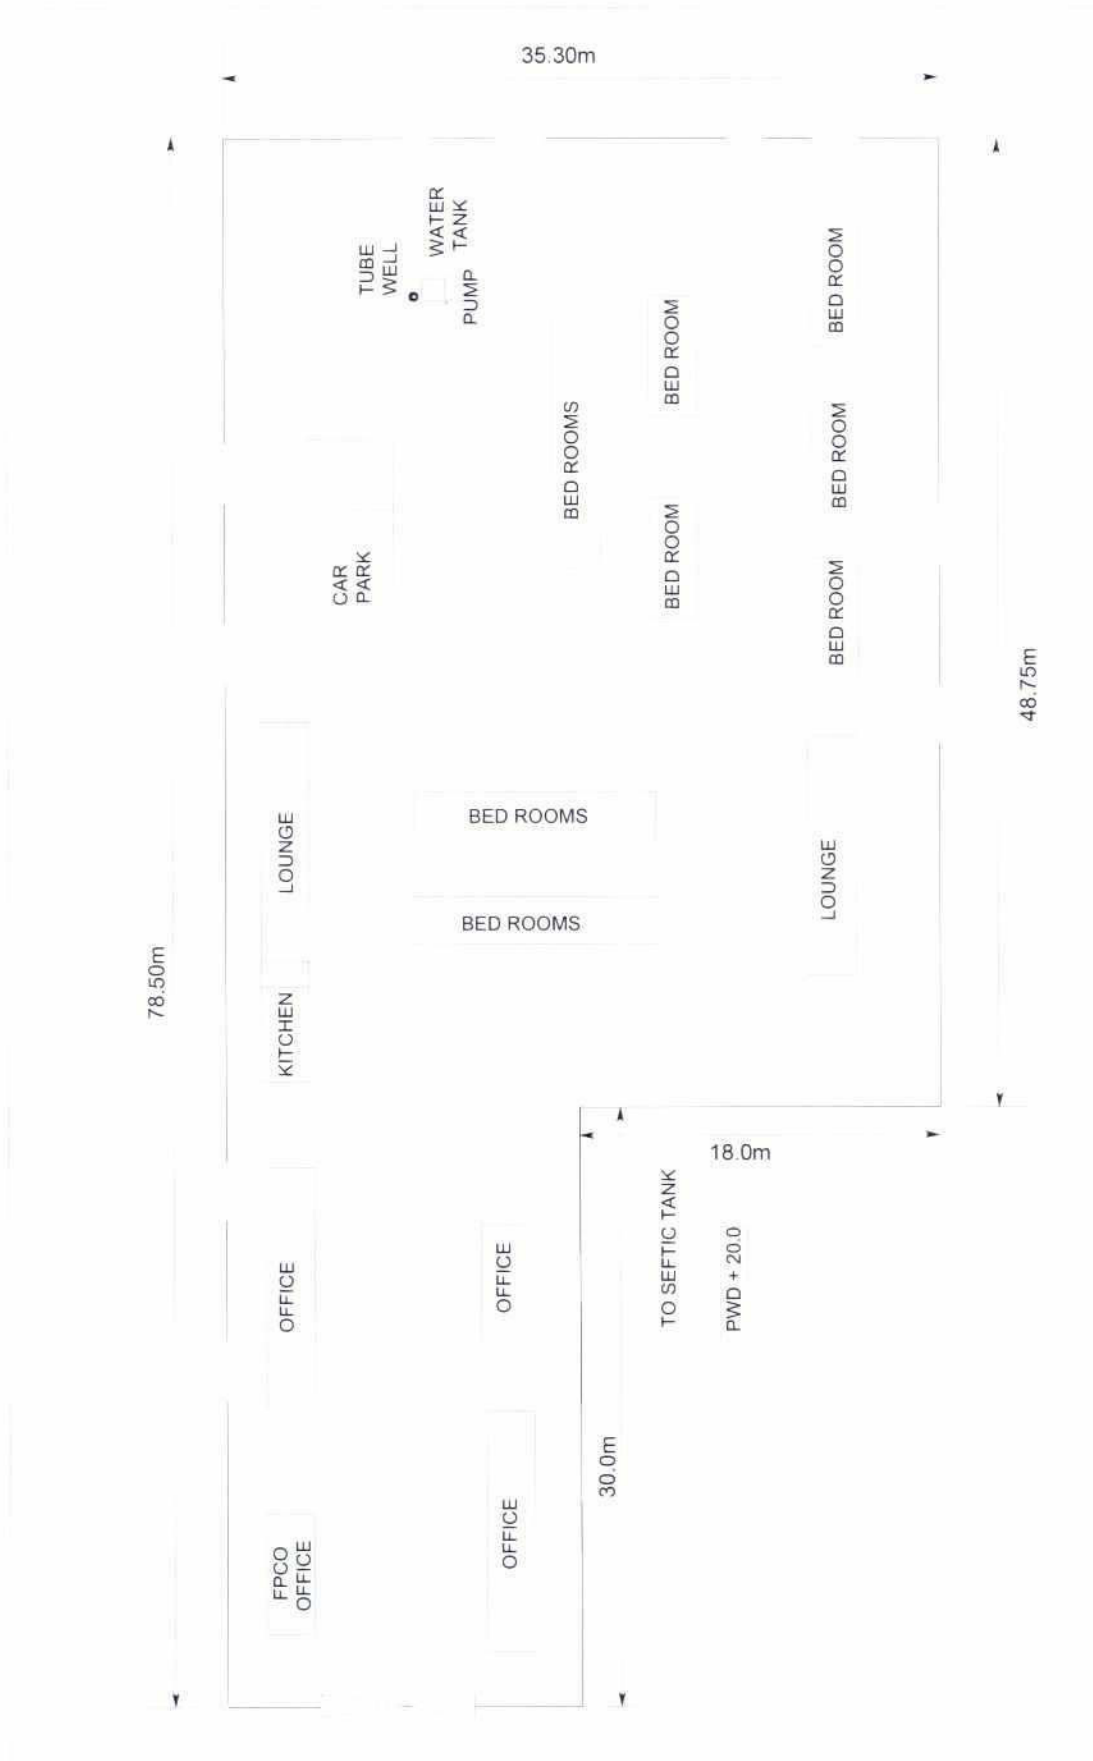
General Layout Consultant/Employer's Camp – Test Site I
